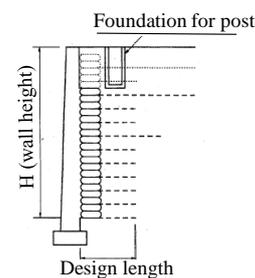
Arrangement when structures are buried in the reinforcement zone
